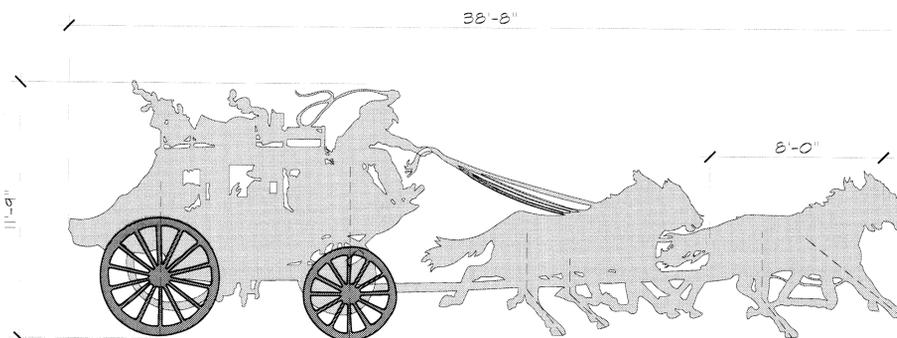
IMAGE SHOWN AS VIEWED FROM NORTH RIDGE DRIVE LOOKING NORTH
